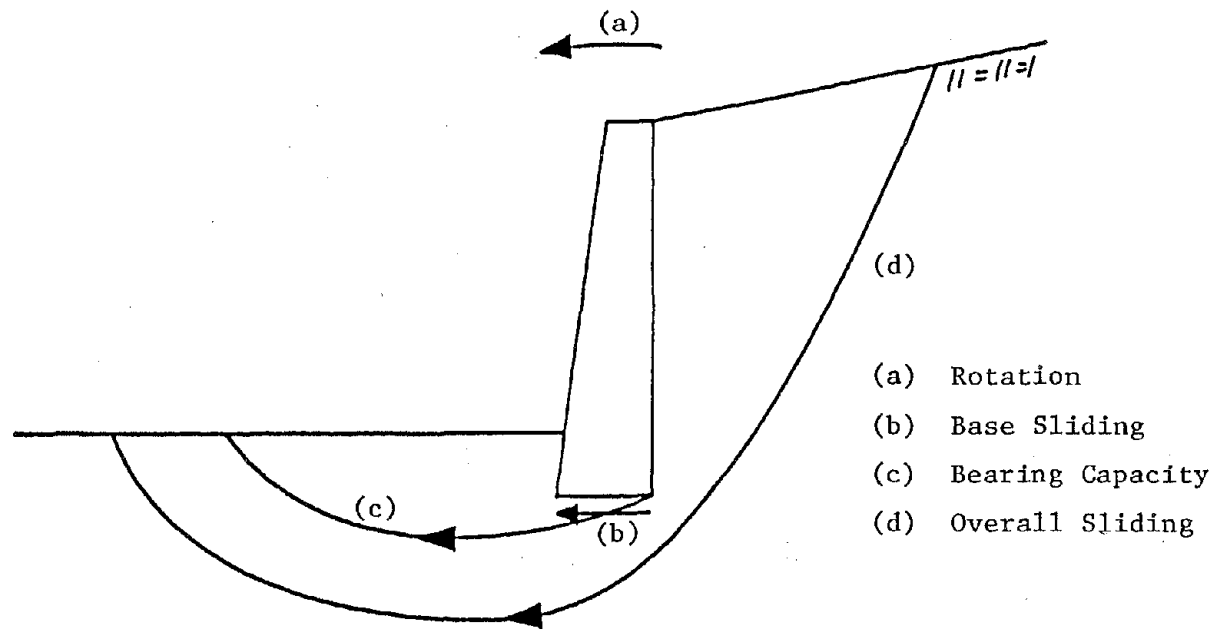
THE POSSIBLE MODES OF FAILURE OF GRAVITY RETAINING WALLS
